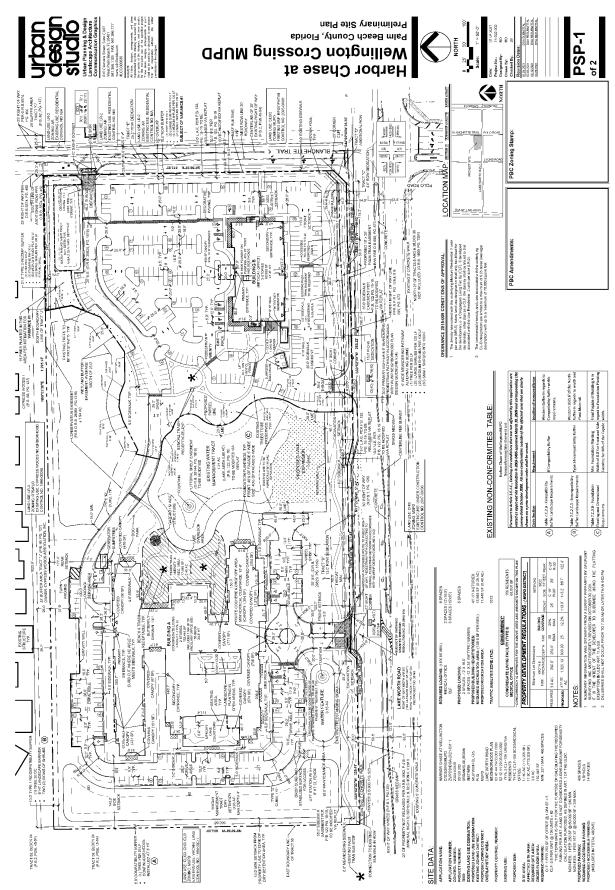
Preliminary Site Plan (PSP 1 of 2) dated April 26, 2021
